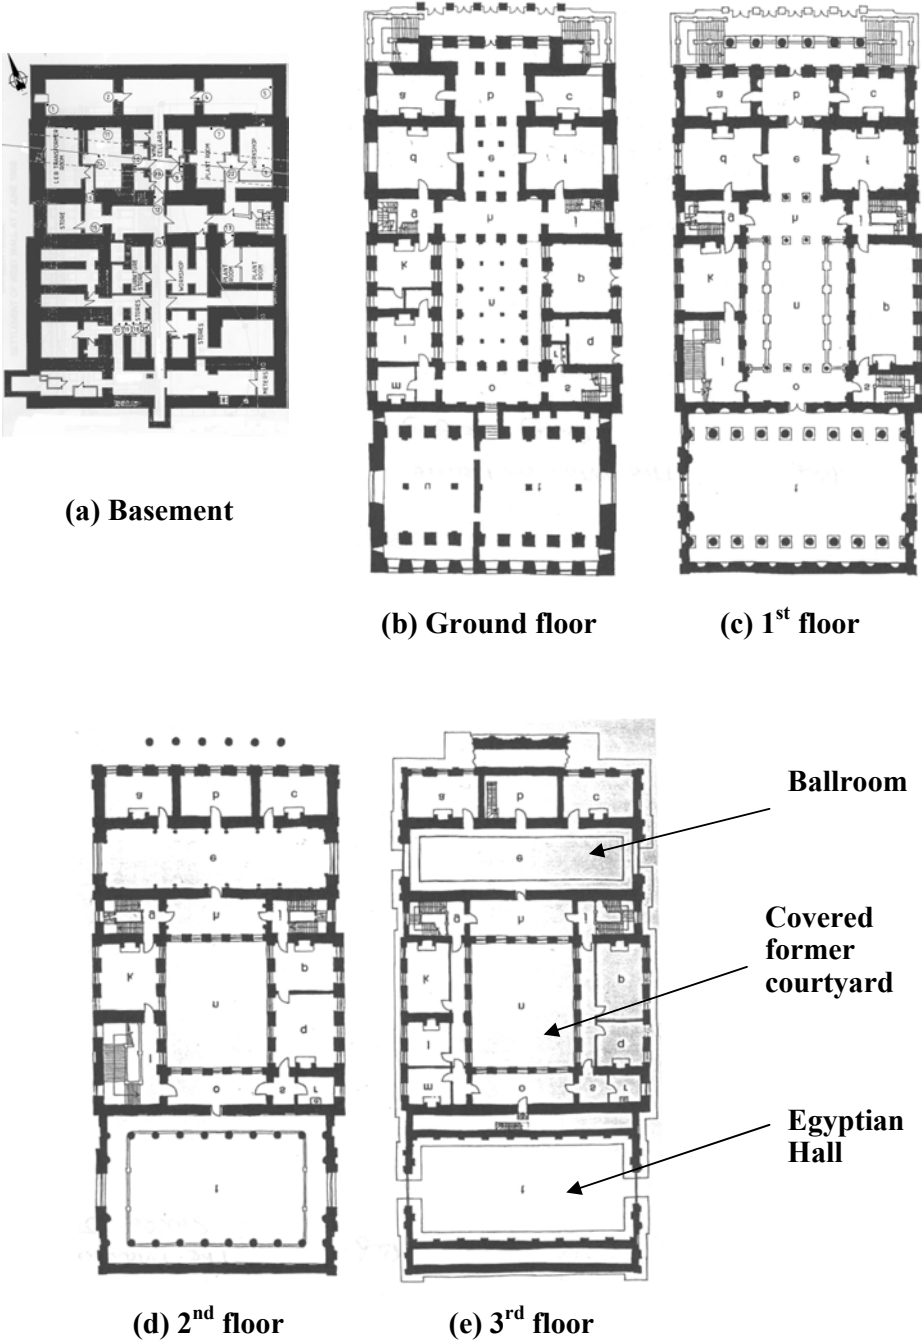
Floor plans of Mansion House (Jeffery, 1993)
